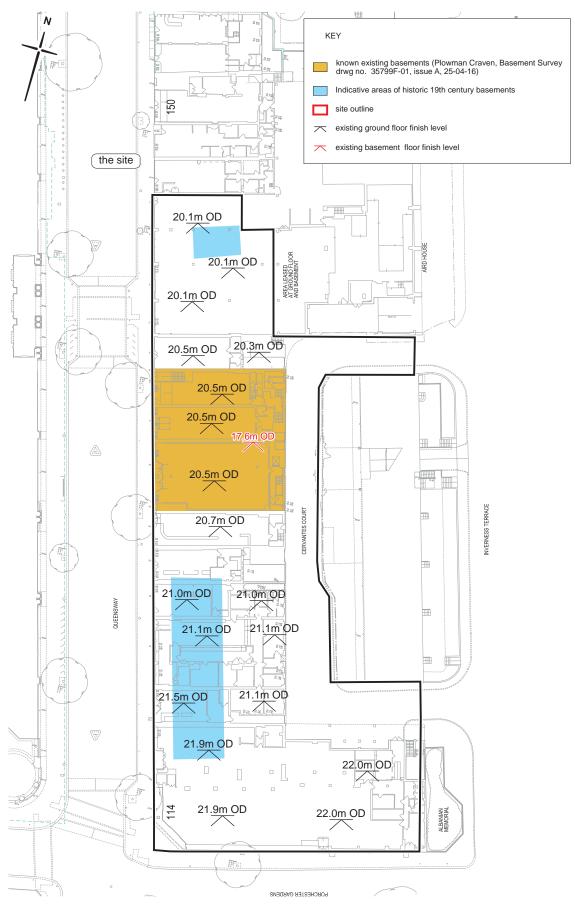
Existing site plan showing current basement and indicative areas of historic basements (msa survey, topographical survey drwg no. 4197-QP-G); (Plowman Craven, Basement Survey drwg no. 35799F-01, issue A, 25-04-16).
